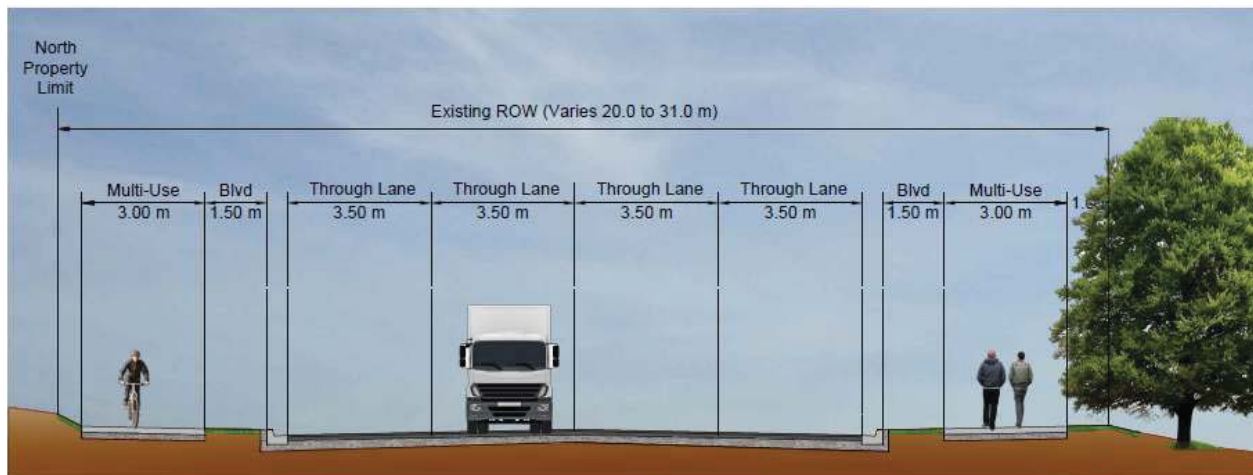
Typical Roadway Cross-Section for York Road West of Beaumont Crescent and East of the Reformatory Entrance.
